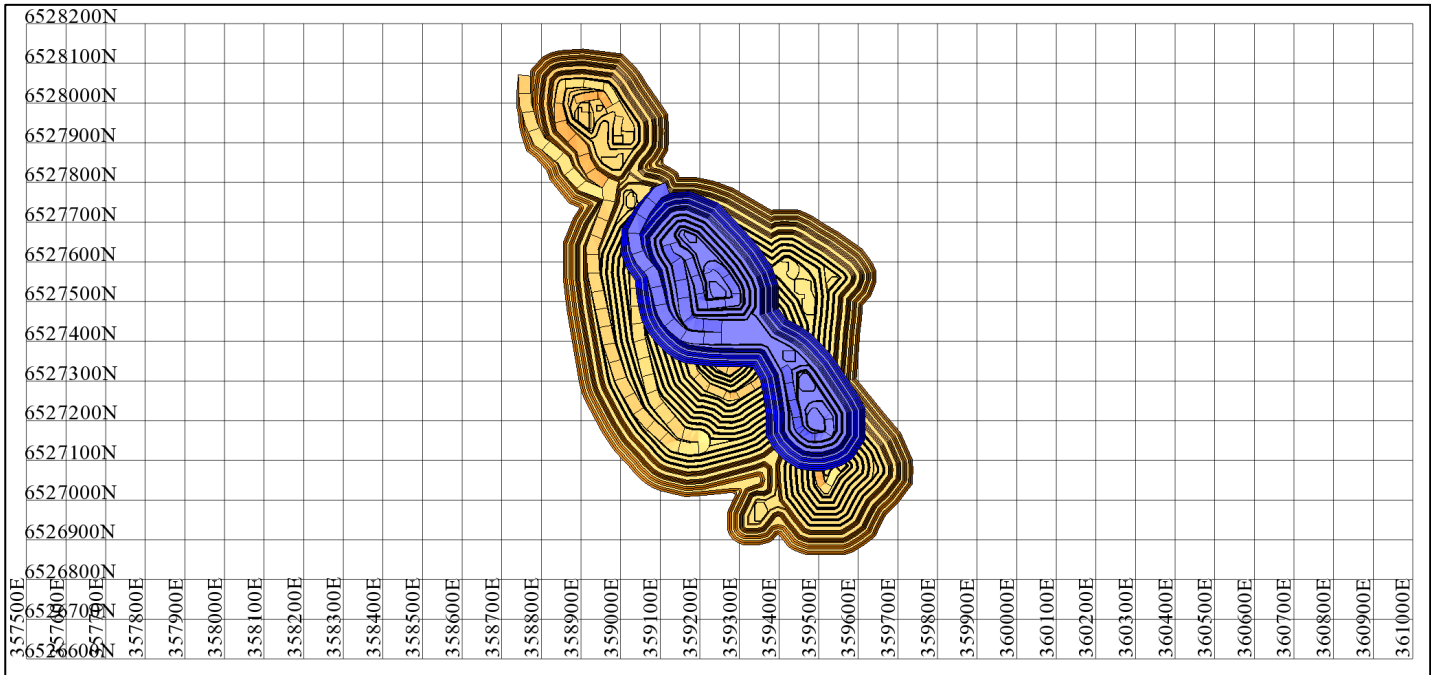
Theia Stage 1 and 2 pit design - Plan view - Reserve Case
